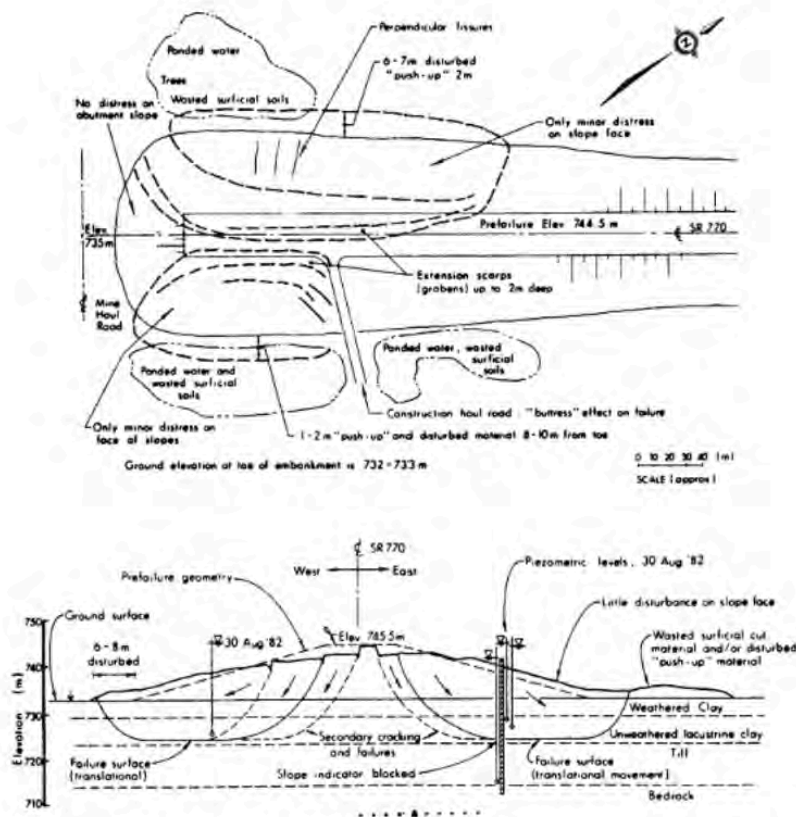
Failure of Embankment on Soft Fissured Clay (after Crooks et al., 1986)
